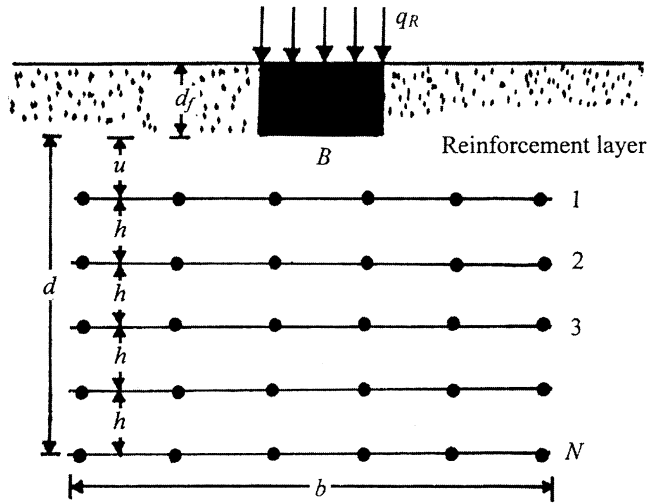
Shallow strip foundation on geogrid-reinforced sand.
